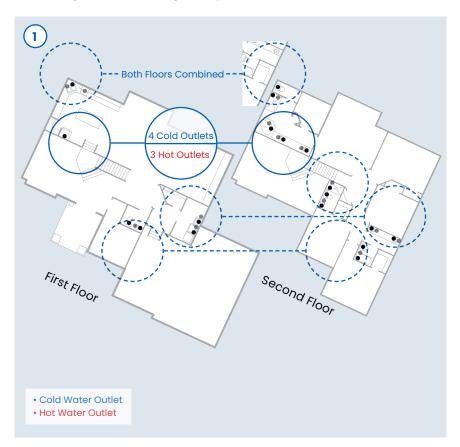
Trunk-and-Branch Plumbing Diagram
